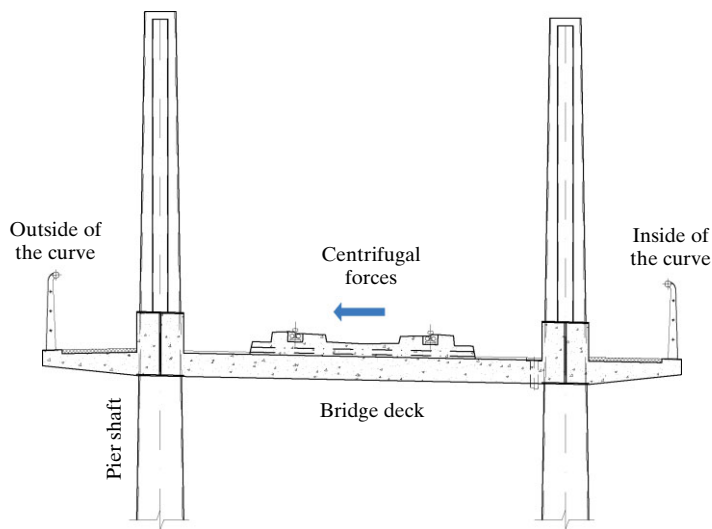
Frame constituted by the shafts of two piers and the bridge deck
